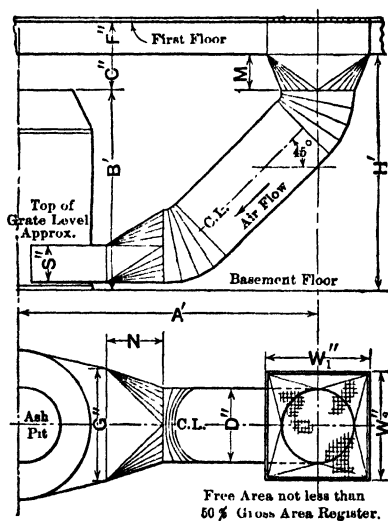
Plan and Elevation of Recirculating Duct and Shoe
